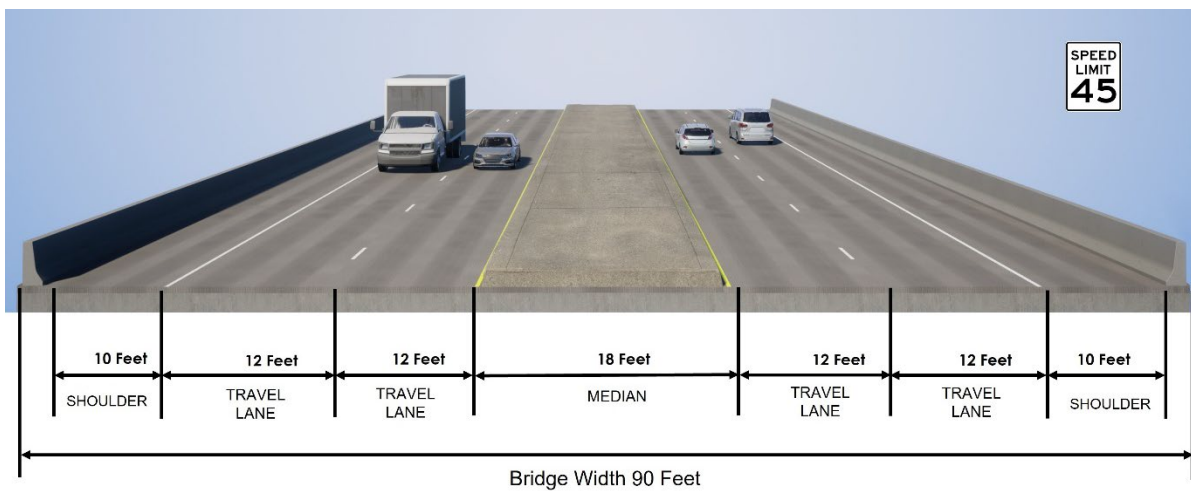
Preferred Alternative US 301/1st Street W over US 41/S Tamiami Trail
